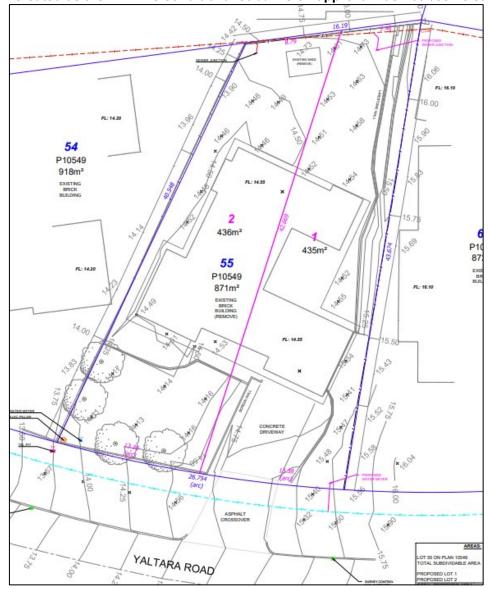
Site plan showing the layout of the two new subdivided lots, which have not yet been created as the WAPC's conditional subdivision approval has not been cleared.
